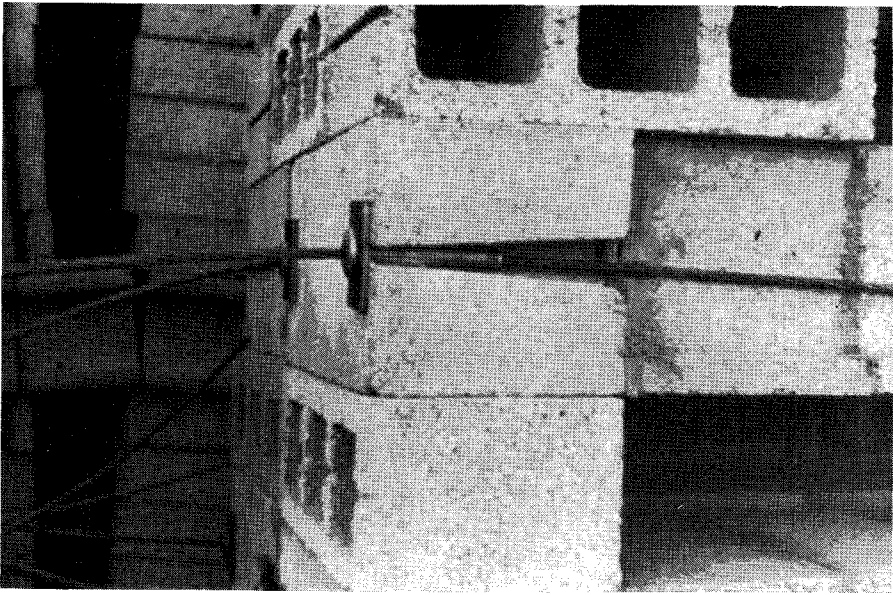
An 8-in. (203 mm) building beam with bonded strands.
